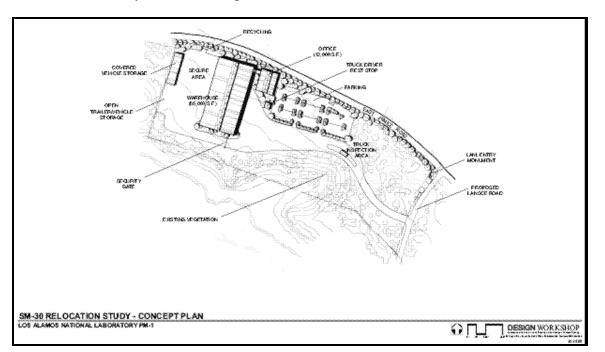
Technical Area 72 Remote Warehouse and Truck Inspection Station Conceptual Layout
